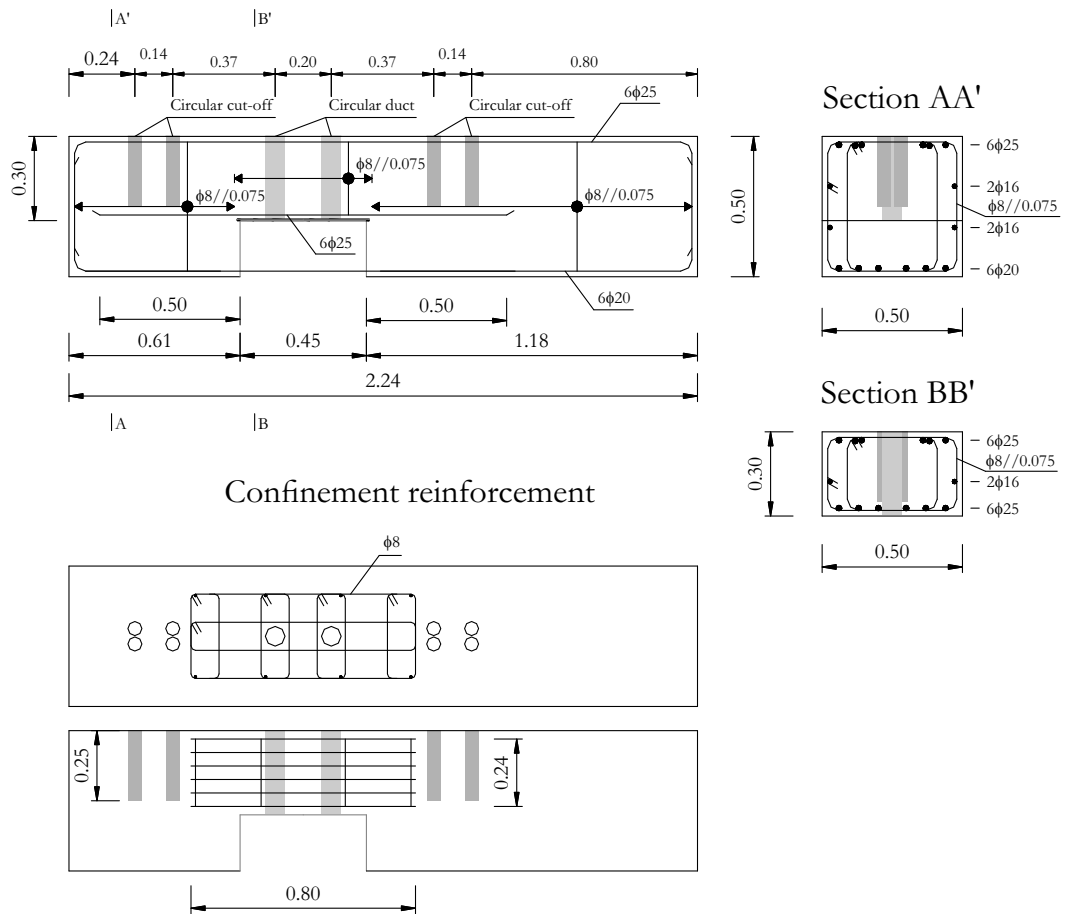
Reinforcement details of base used for specimens RM5 to RM6.
